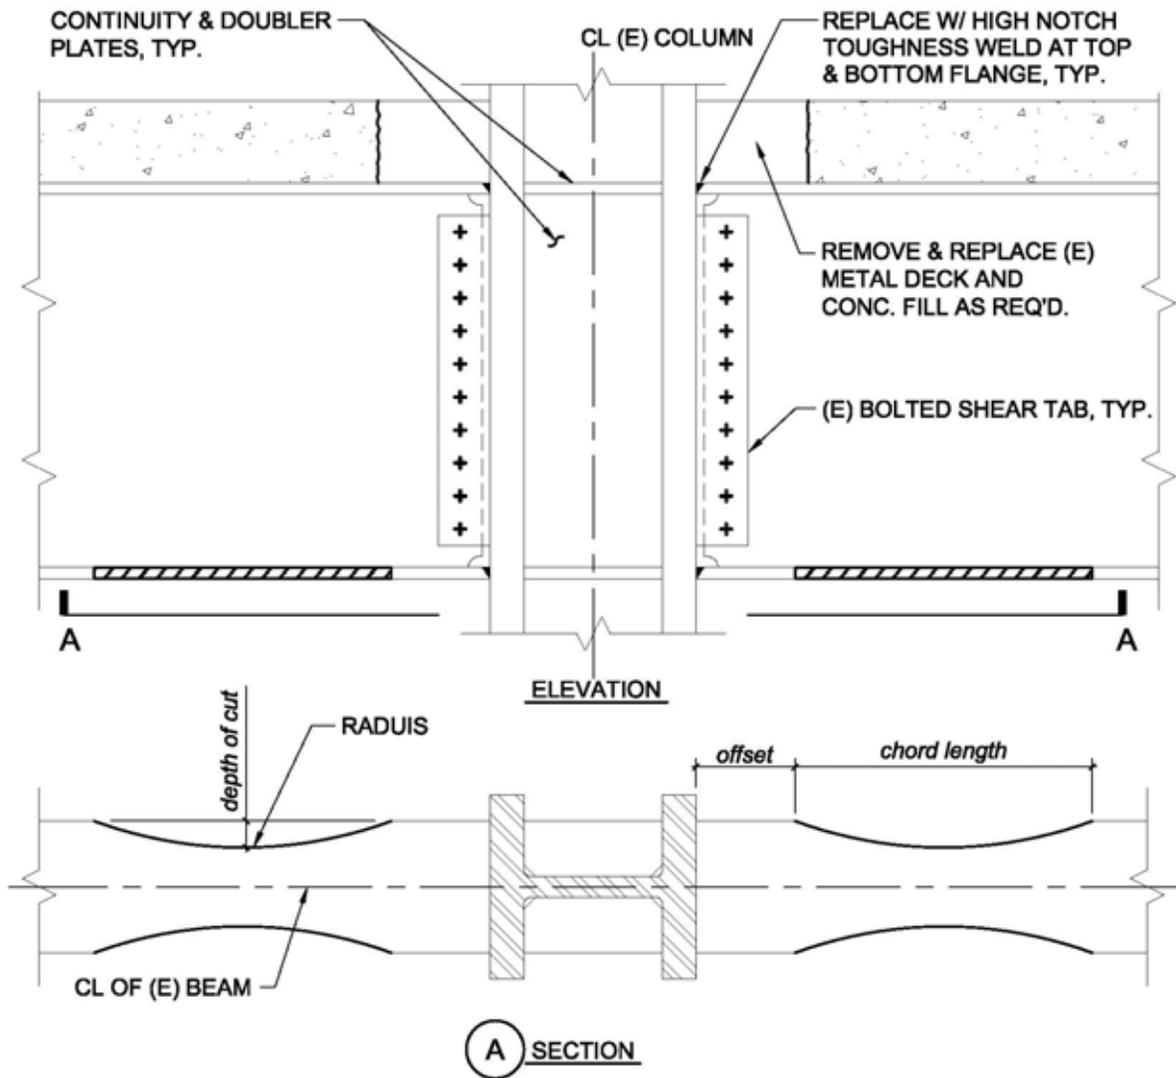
Reduced Beam Section at Bottom Flange of Existing Beam
